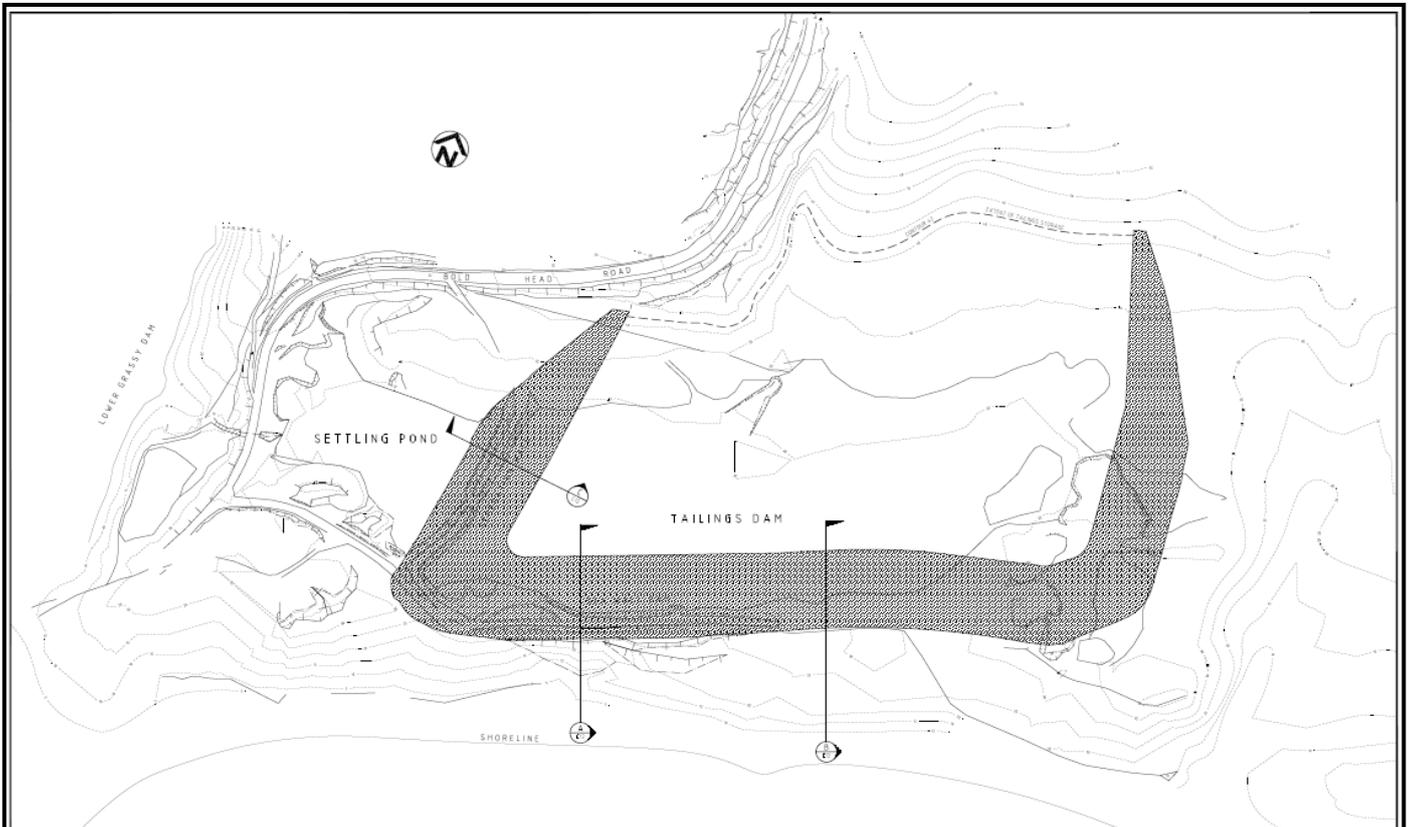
Layout of Current Tailings Dam Site with Test Sites
